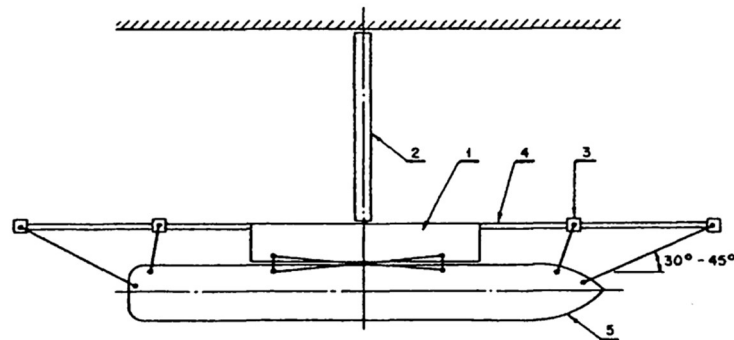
Typical one-berth layout of dock structure with mooring dolphins: 1—pier; 2—access trestle; 3—mooring dolphin; 4—gangway; 5—ship.
